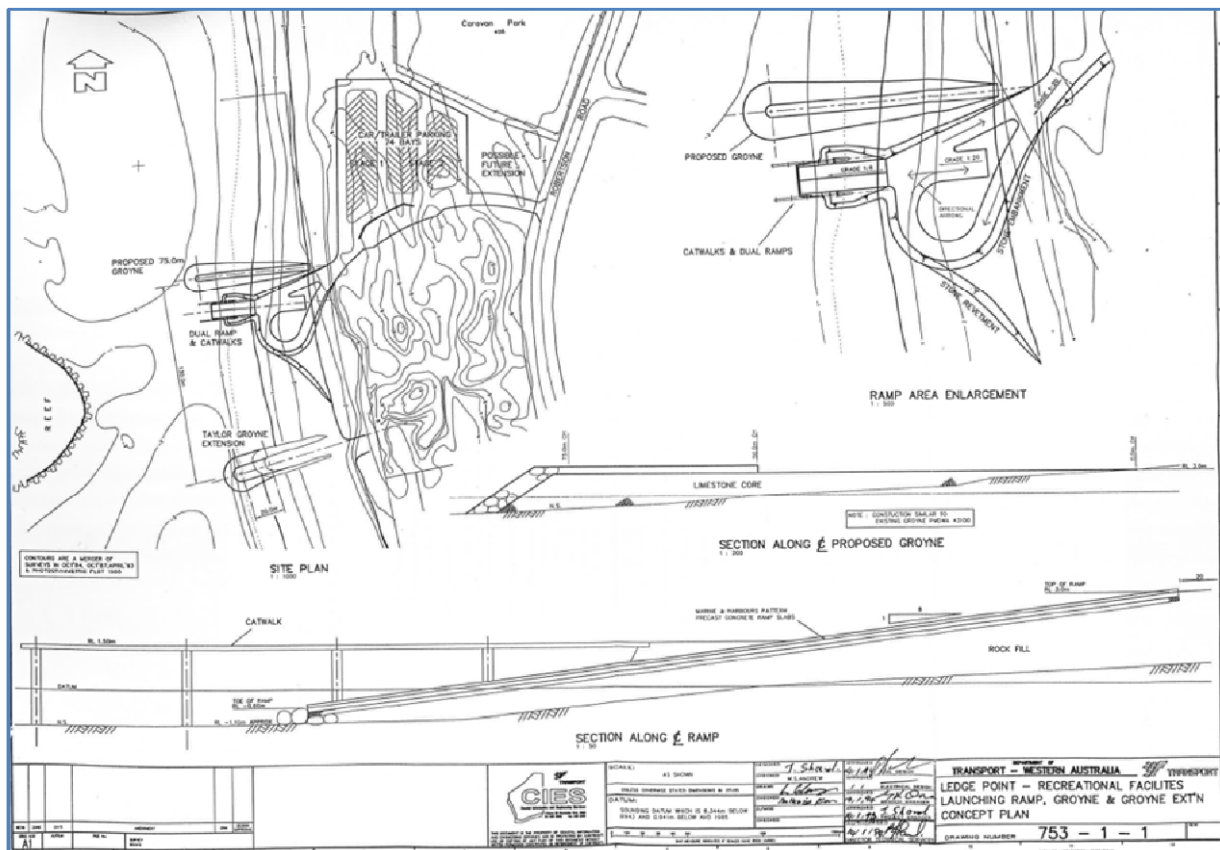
Proposed Ledge Point Boat Launching Facility (DoT 1996)
